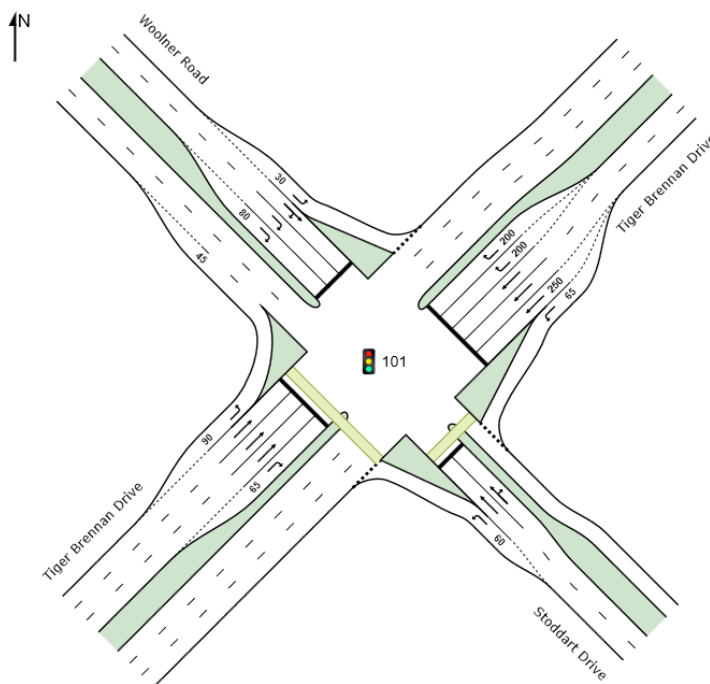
Intersection 1 Modelled SIDRA Layout
